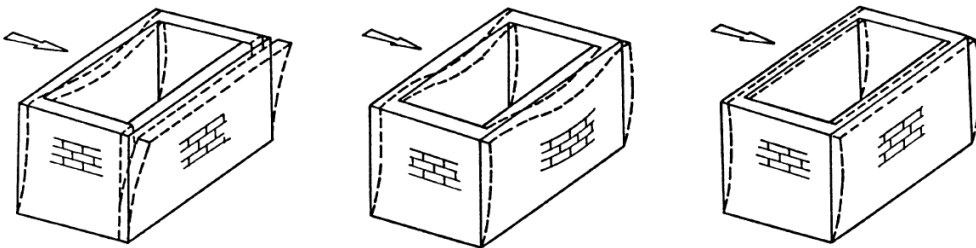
Response of simple masonry building to horizontal actions: building with deformable floors without ties (left), building with deformable floors and tied walls (middle) and building with rigid floors and tie-beams (right) (from Macchi and Magenes, 2002).
